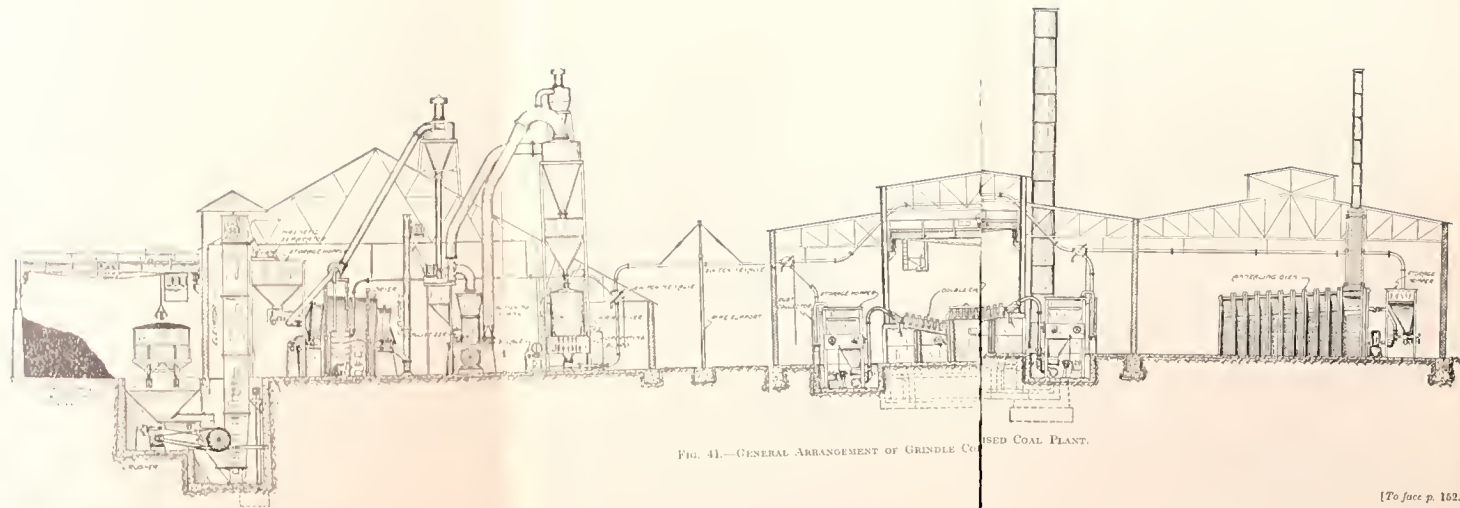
GENERAL ARRANGEMENT OF GRINDLE COAL PLANT.
